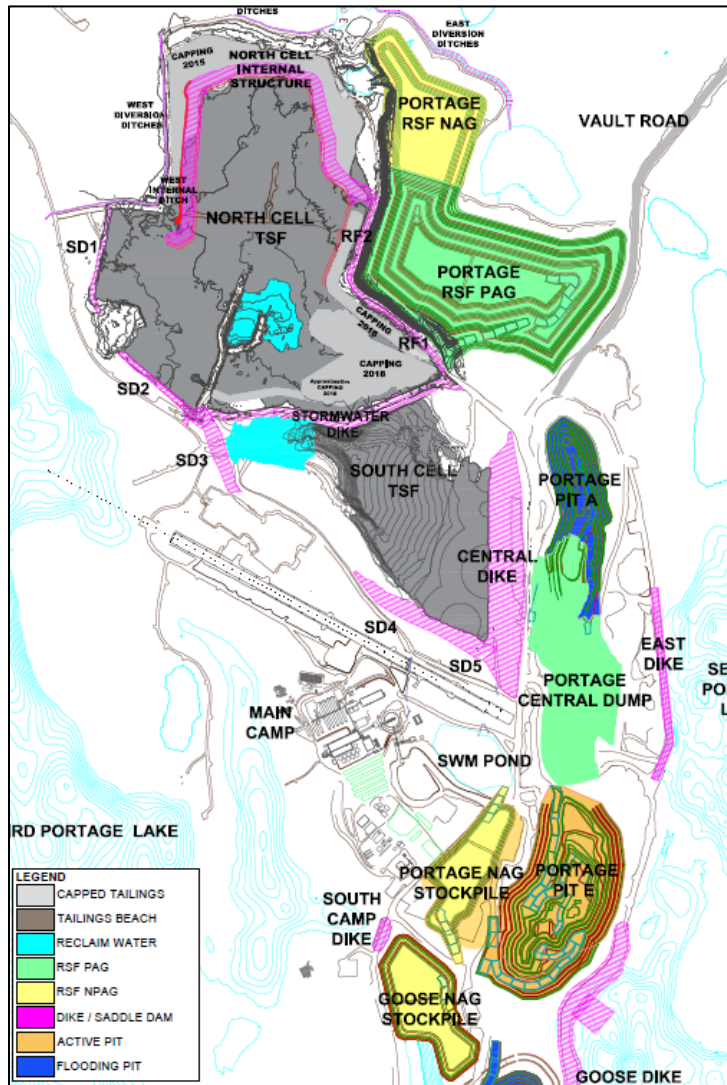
Portage Pit and Tailings Storage Facility Infrastructures
